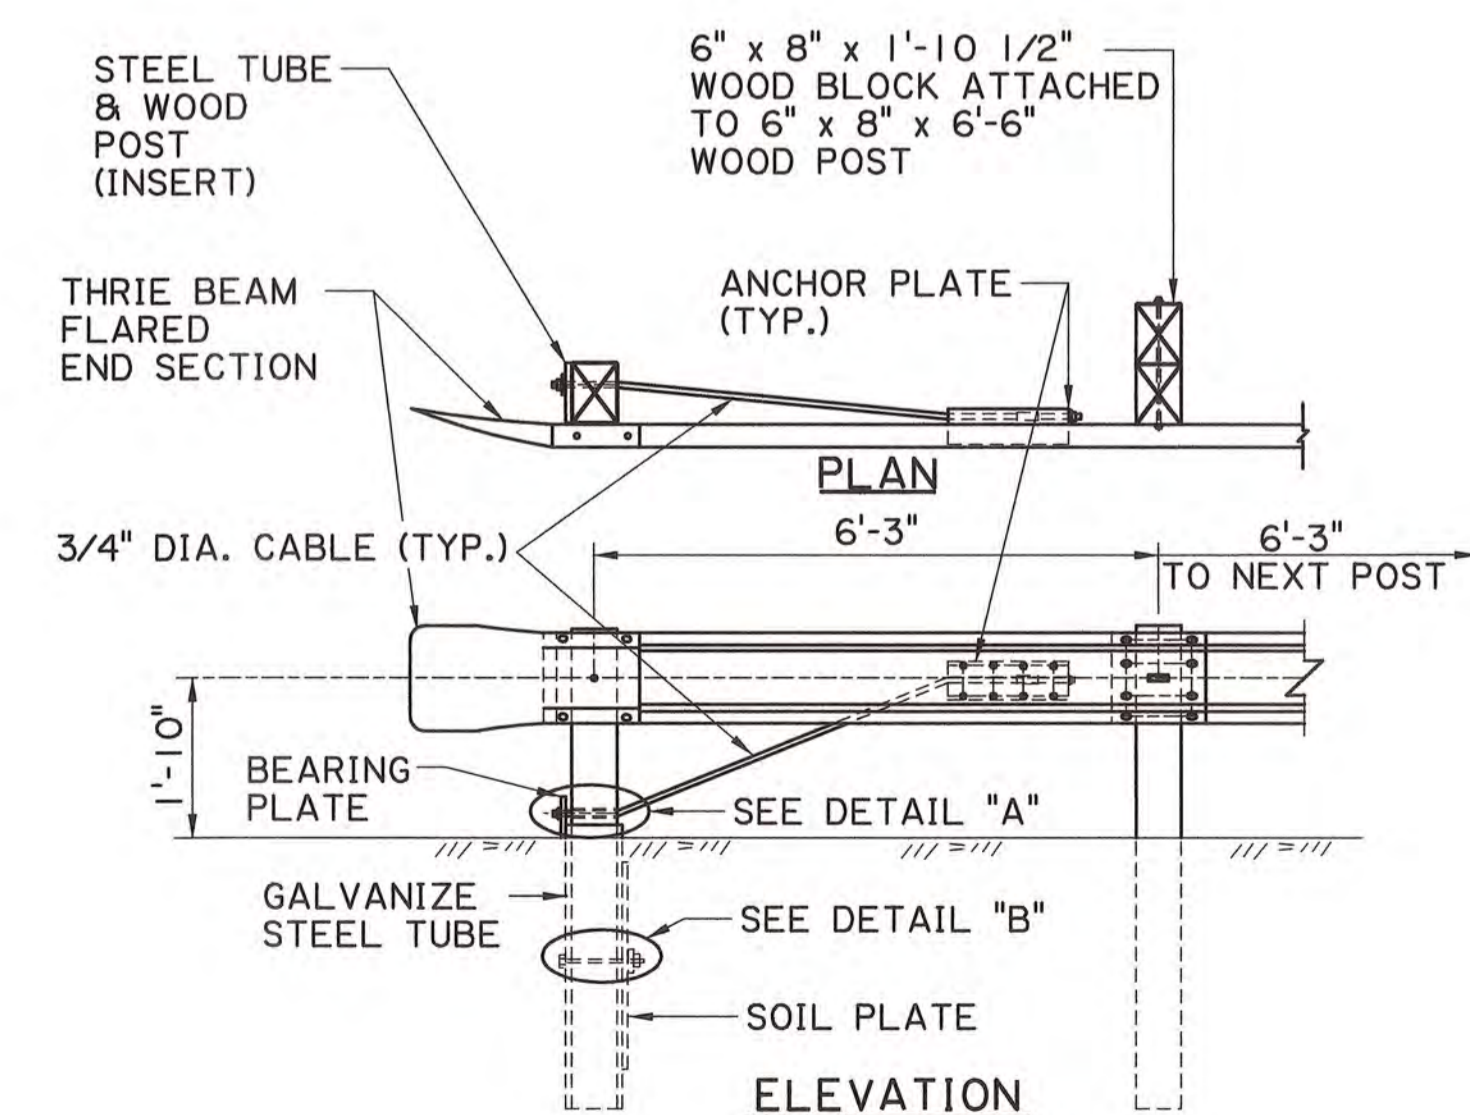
" x 8" WOOD POSTS AND WOOD BLOCKS-STD. GUARD RAIL
